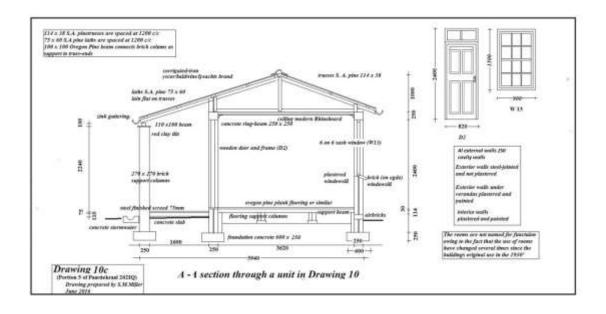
Above. Section A –A through unit in Drawing 10. (Drawing S.M. Miller 2016.)
